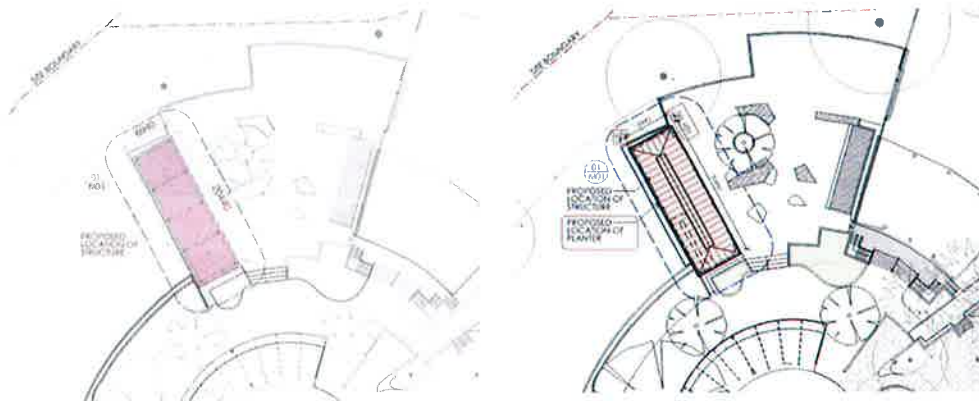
DA approved (left) and proposed (right) Site Plan (Source: Akin Creative).
